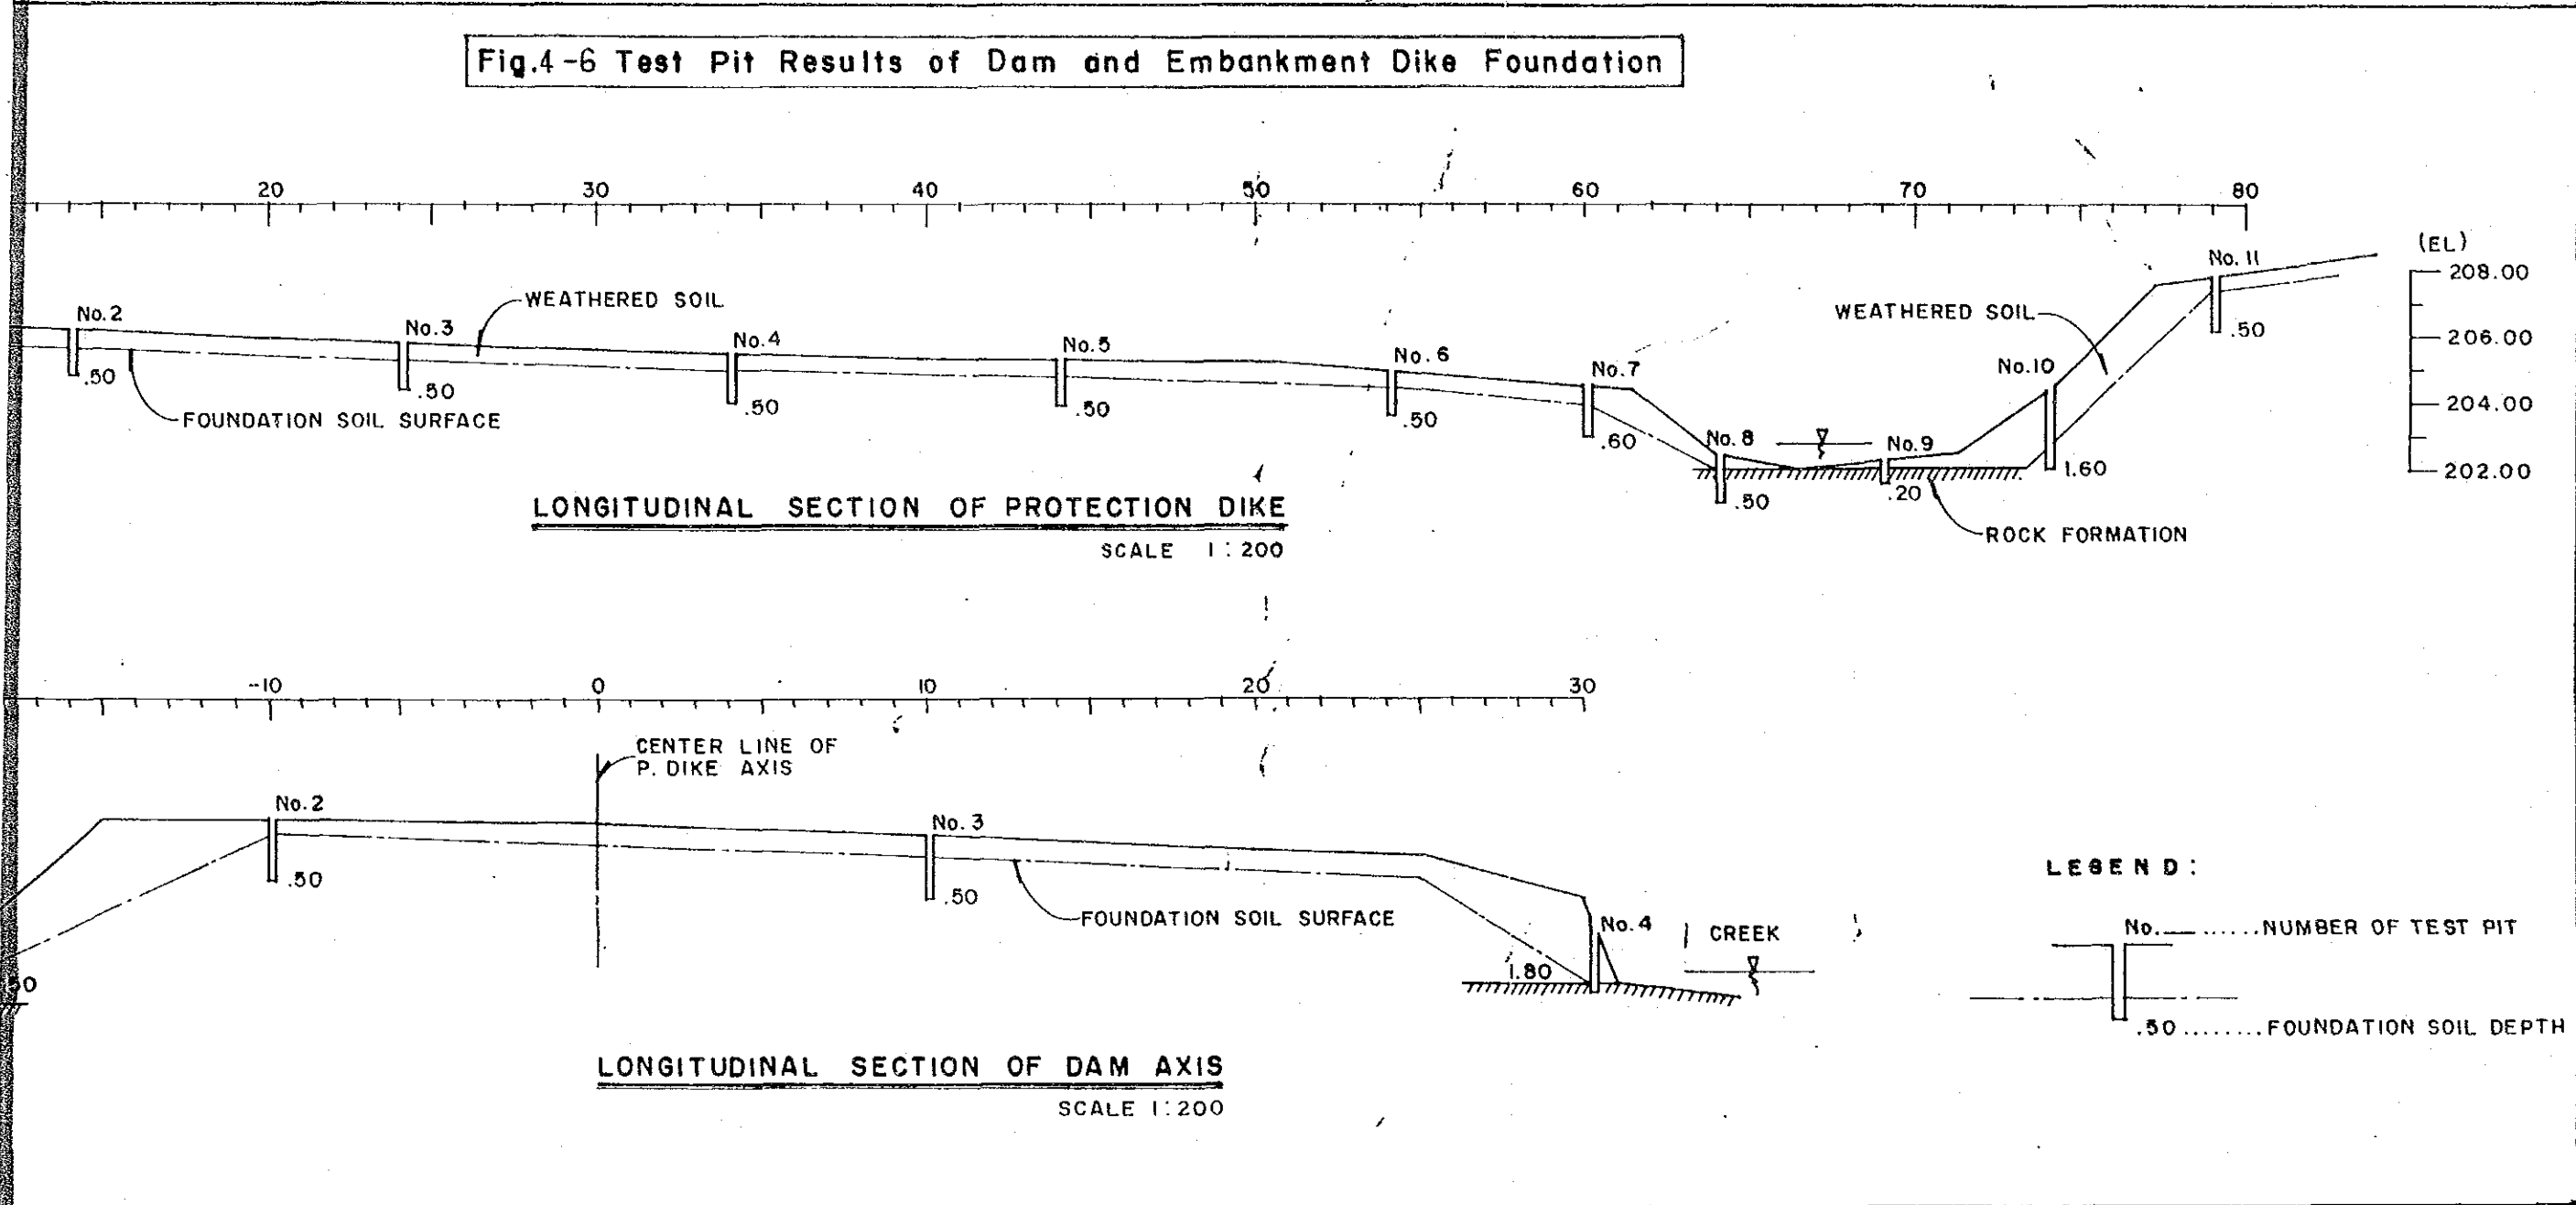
Test Pit Results of Dam and Embankment Dike Foundation
